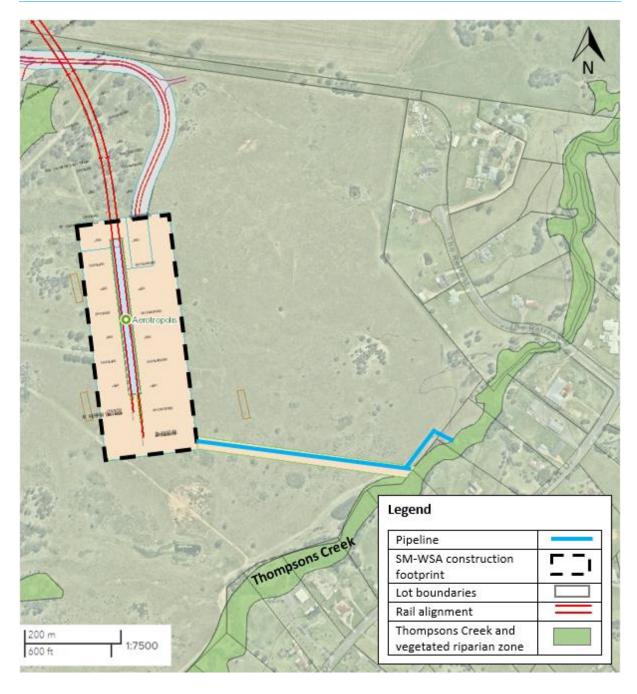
Aerotropolis Core construction footprint with WTP pipeline
